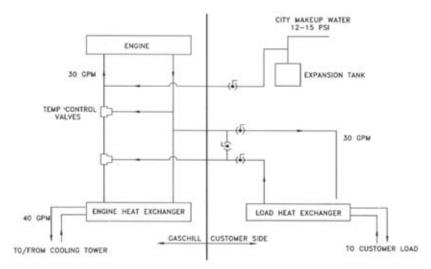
TYPICAL HEAT RECOVERY PIPING LAYOUT
